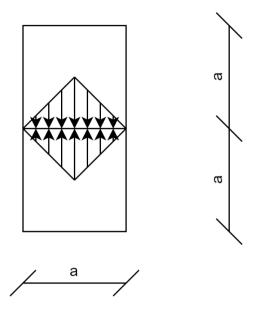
Top view of two square plates and the beams on which they support. Every plate transfers  $\frac{1}{4}$ th of its area load to the beam
